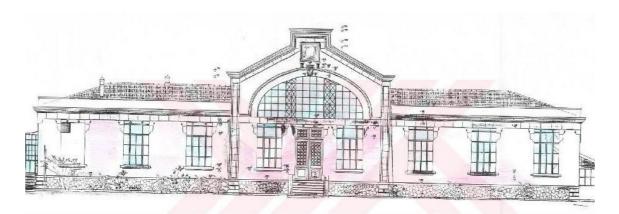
15. The windows and facade layout of Cendere Water Pump Station (Kaya, 1998)
